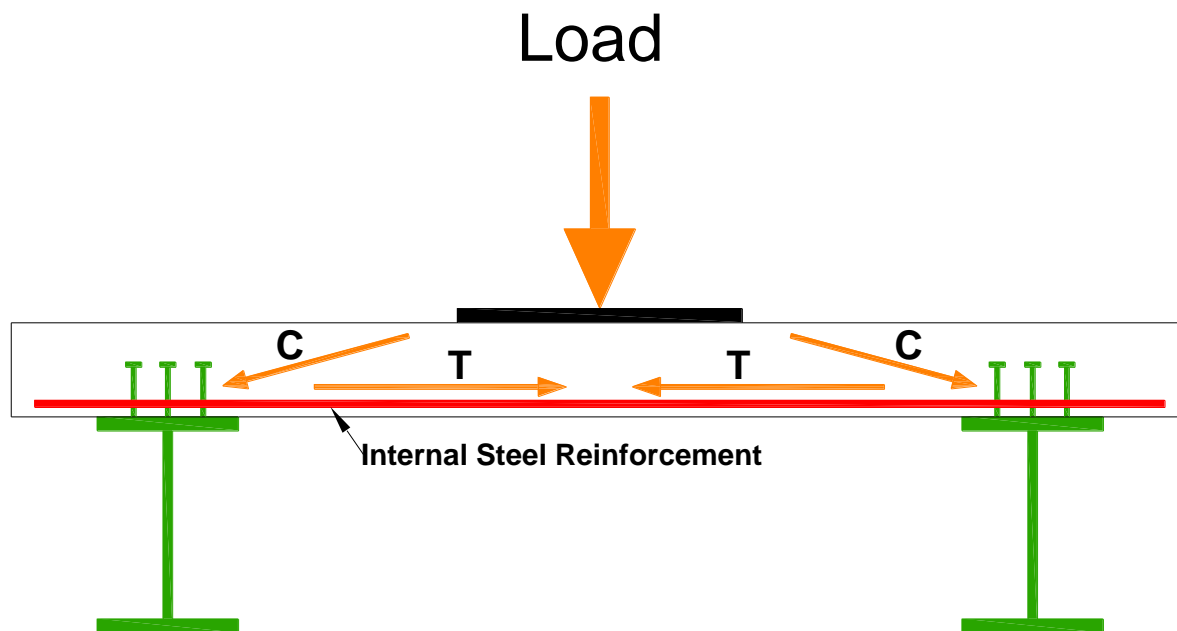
Arching action in a conventional steel reinforced bridge deck slab under concentrated load
